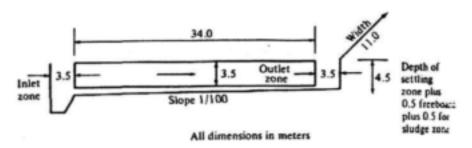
Design example for inlet-, outlet- and sludge zones (Peavy et al, 1985).
